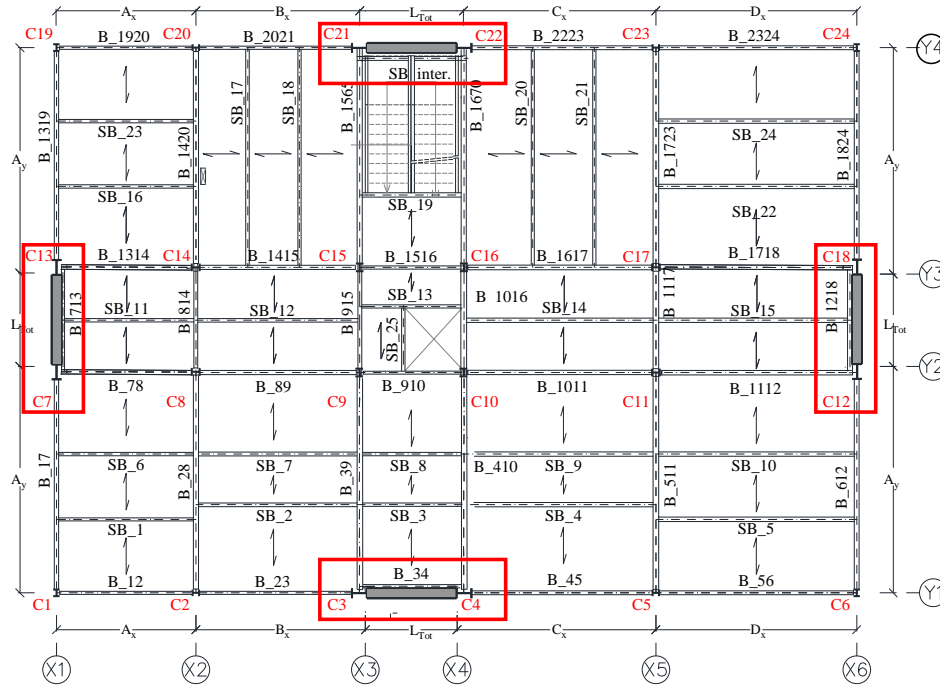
Plant configuration of the case study and positions of the HCSW systems.
